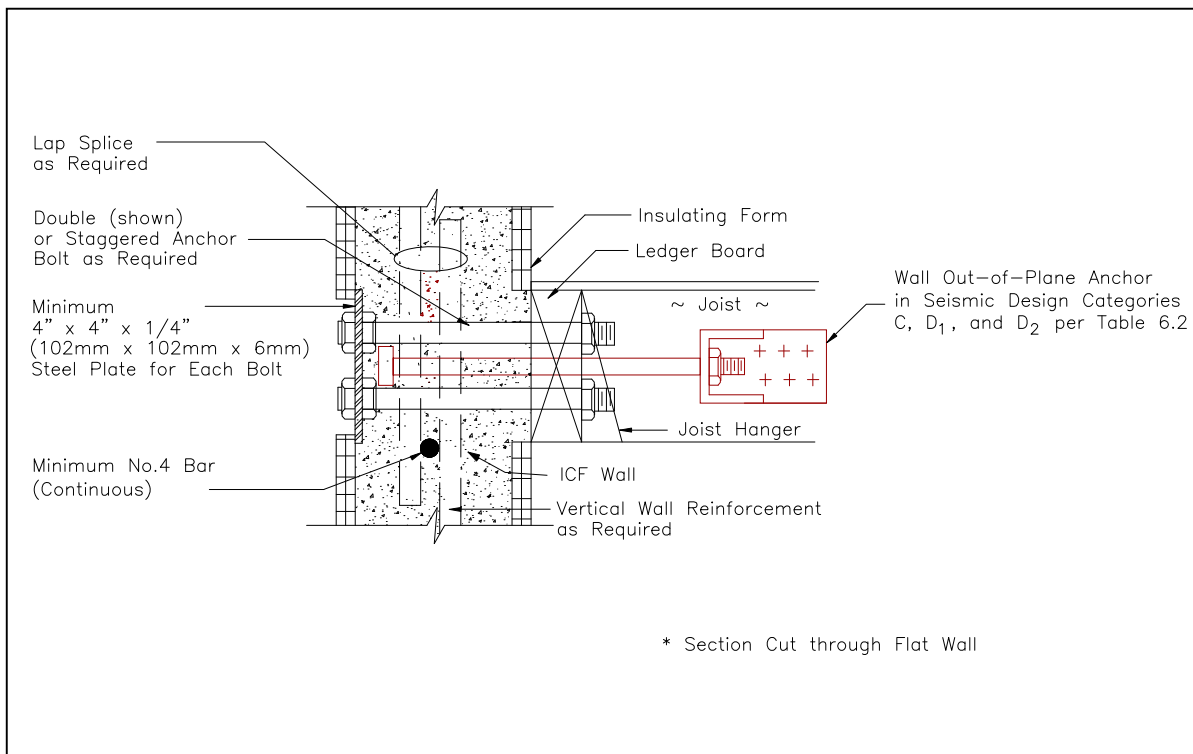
Floor Ledger-ICF Wall Connection (Side-Bearing Connection)
